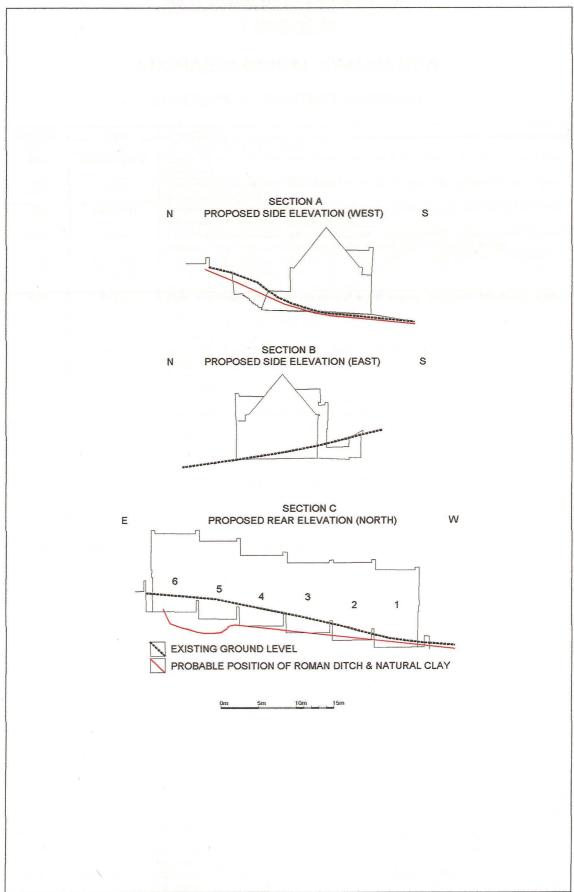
Sections showing proposed development and existing ground level (scale 1:500).
